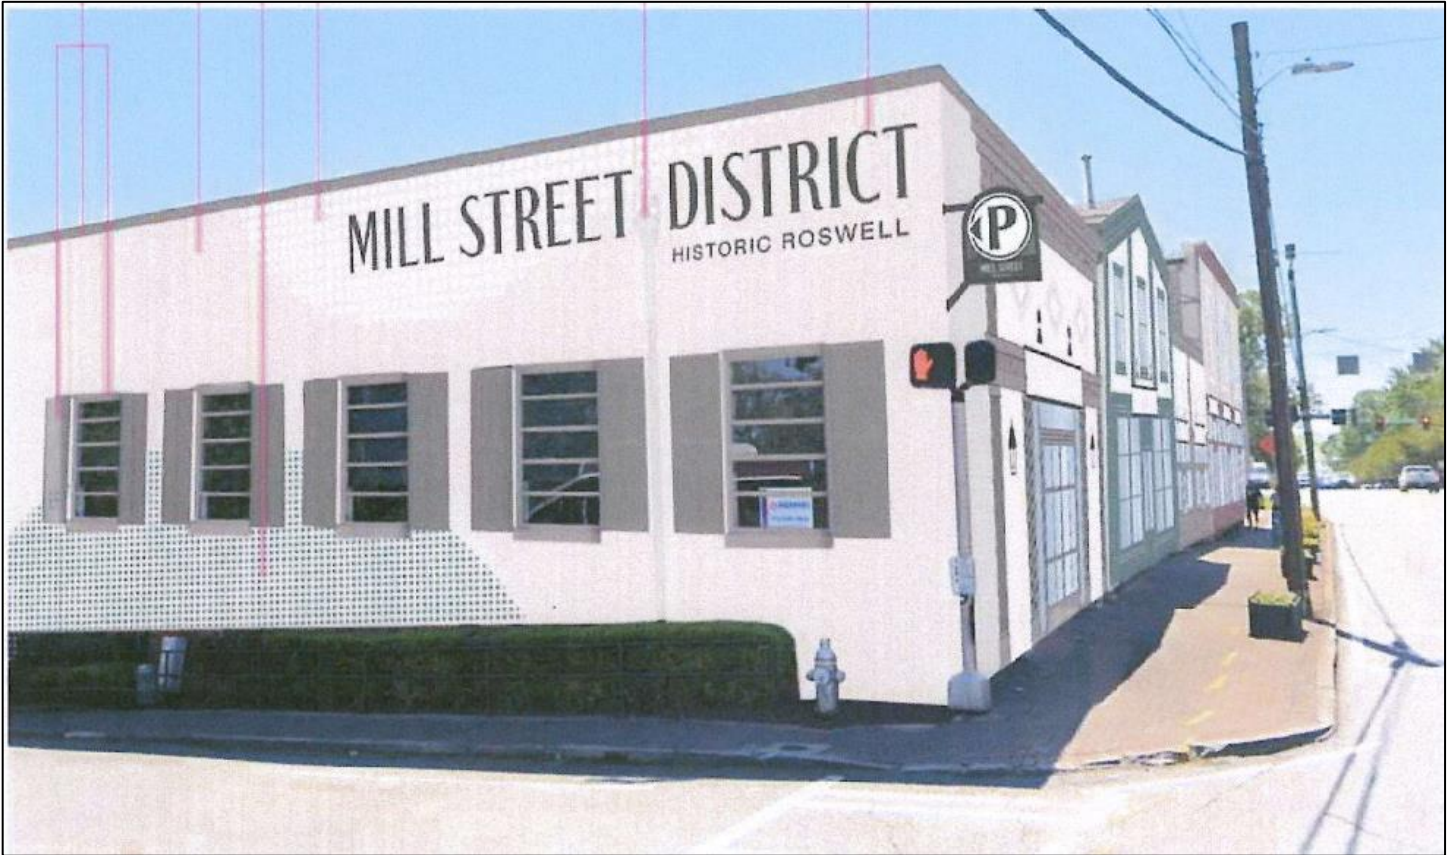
Proposed façades of 617 Atlanta Street, with all painting complete (from applicant)
